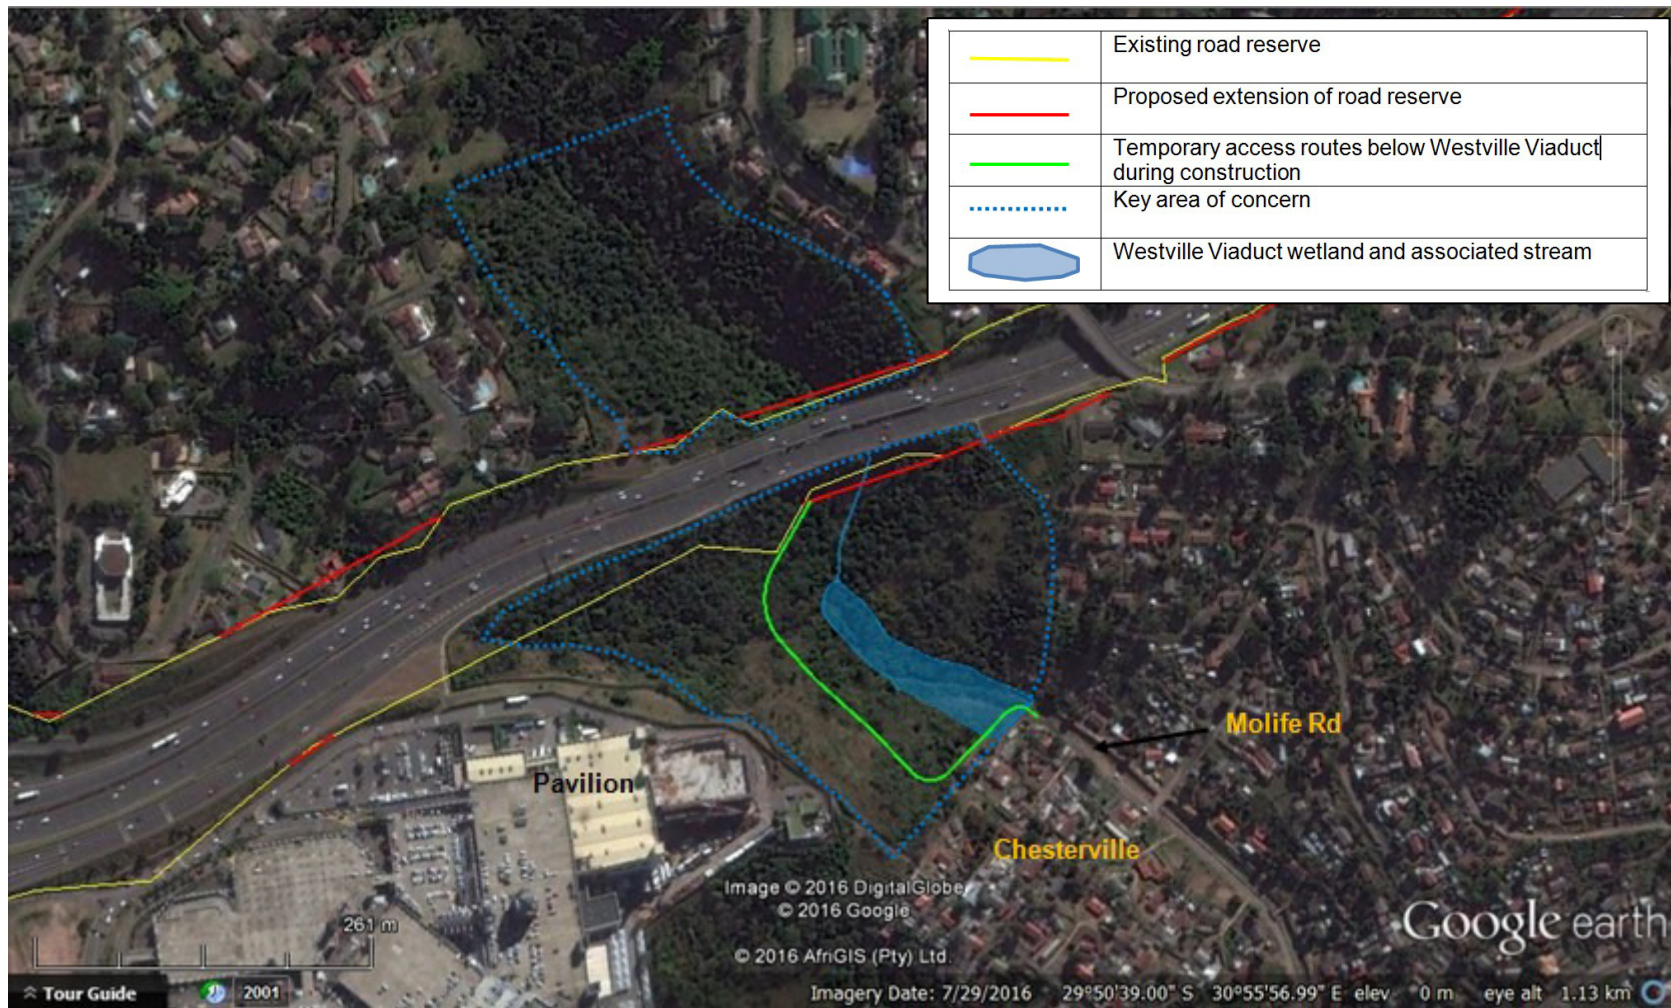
Plan showing proposed route of the construction access road to Westville Viaduct
